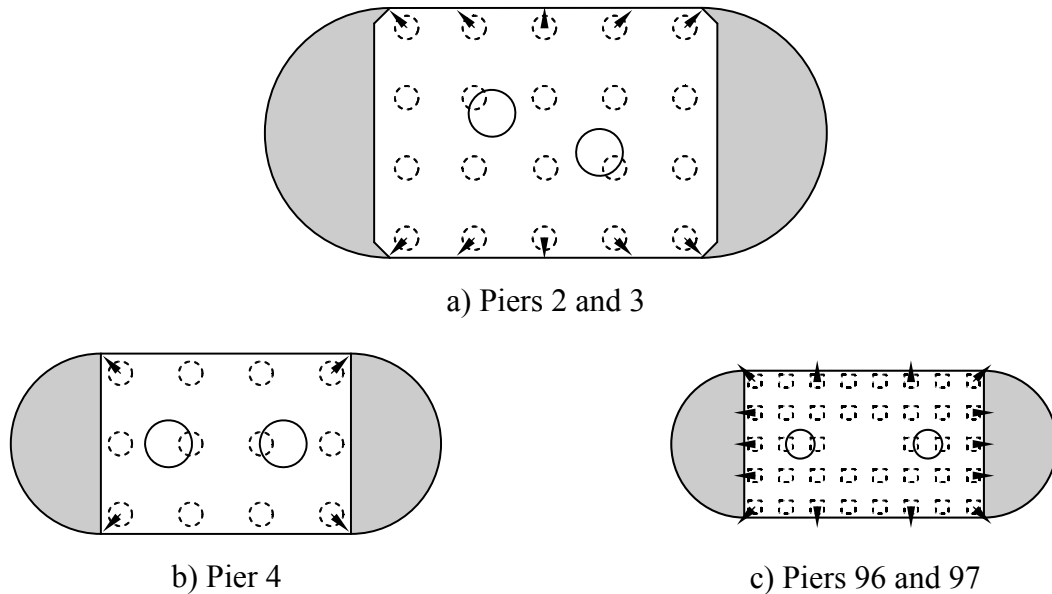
LA-1 Bridge pier footing end cap retrofit to reduce vessel collision risk (retrofitted end caps indicated in grey)
